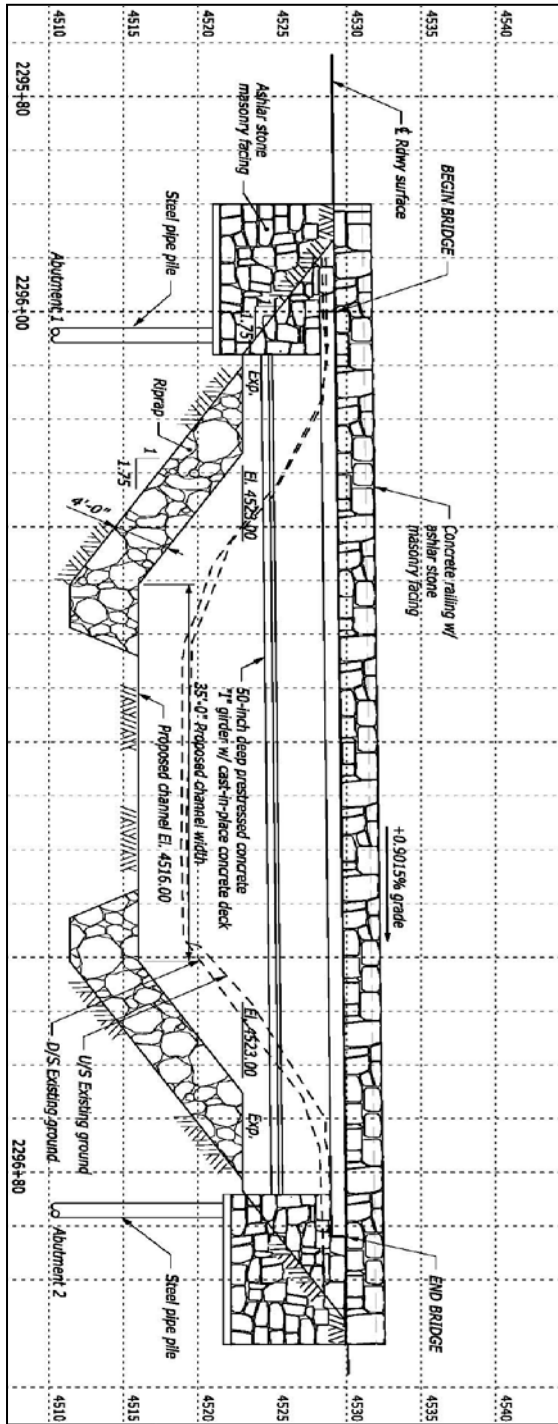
Preliminary design layout for the new Rose Creek Bridge; typical bridge section depicting elevations.
